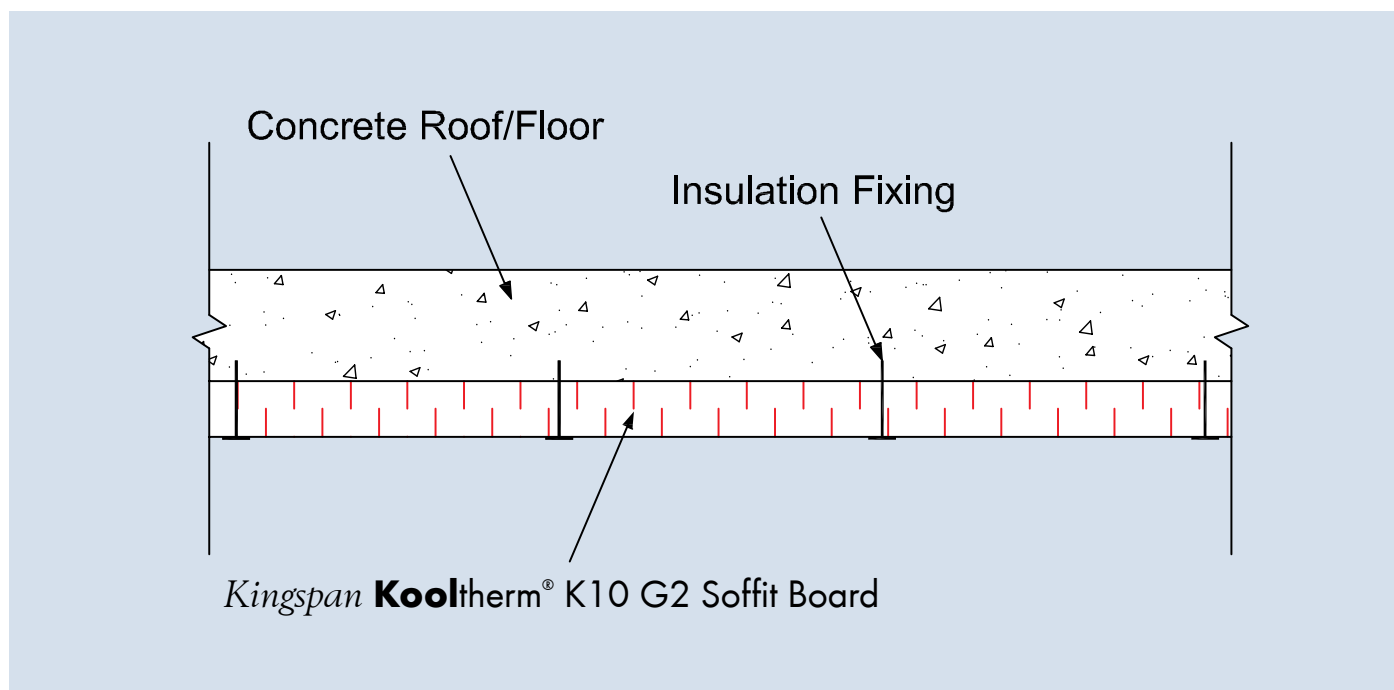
Side elevation - Concrete Soffit with Kingspan Kooltherm® K10 G2 Soffit Board
